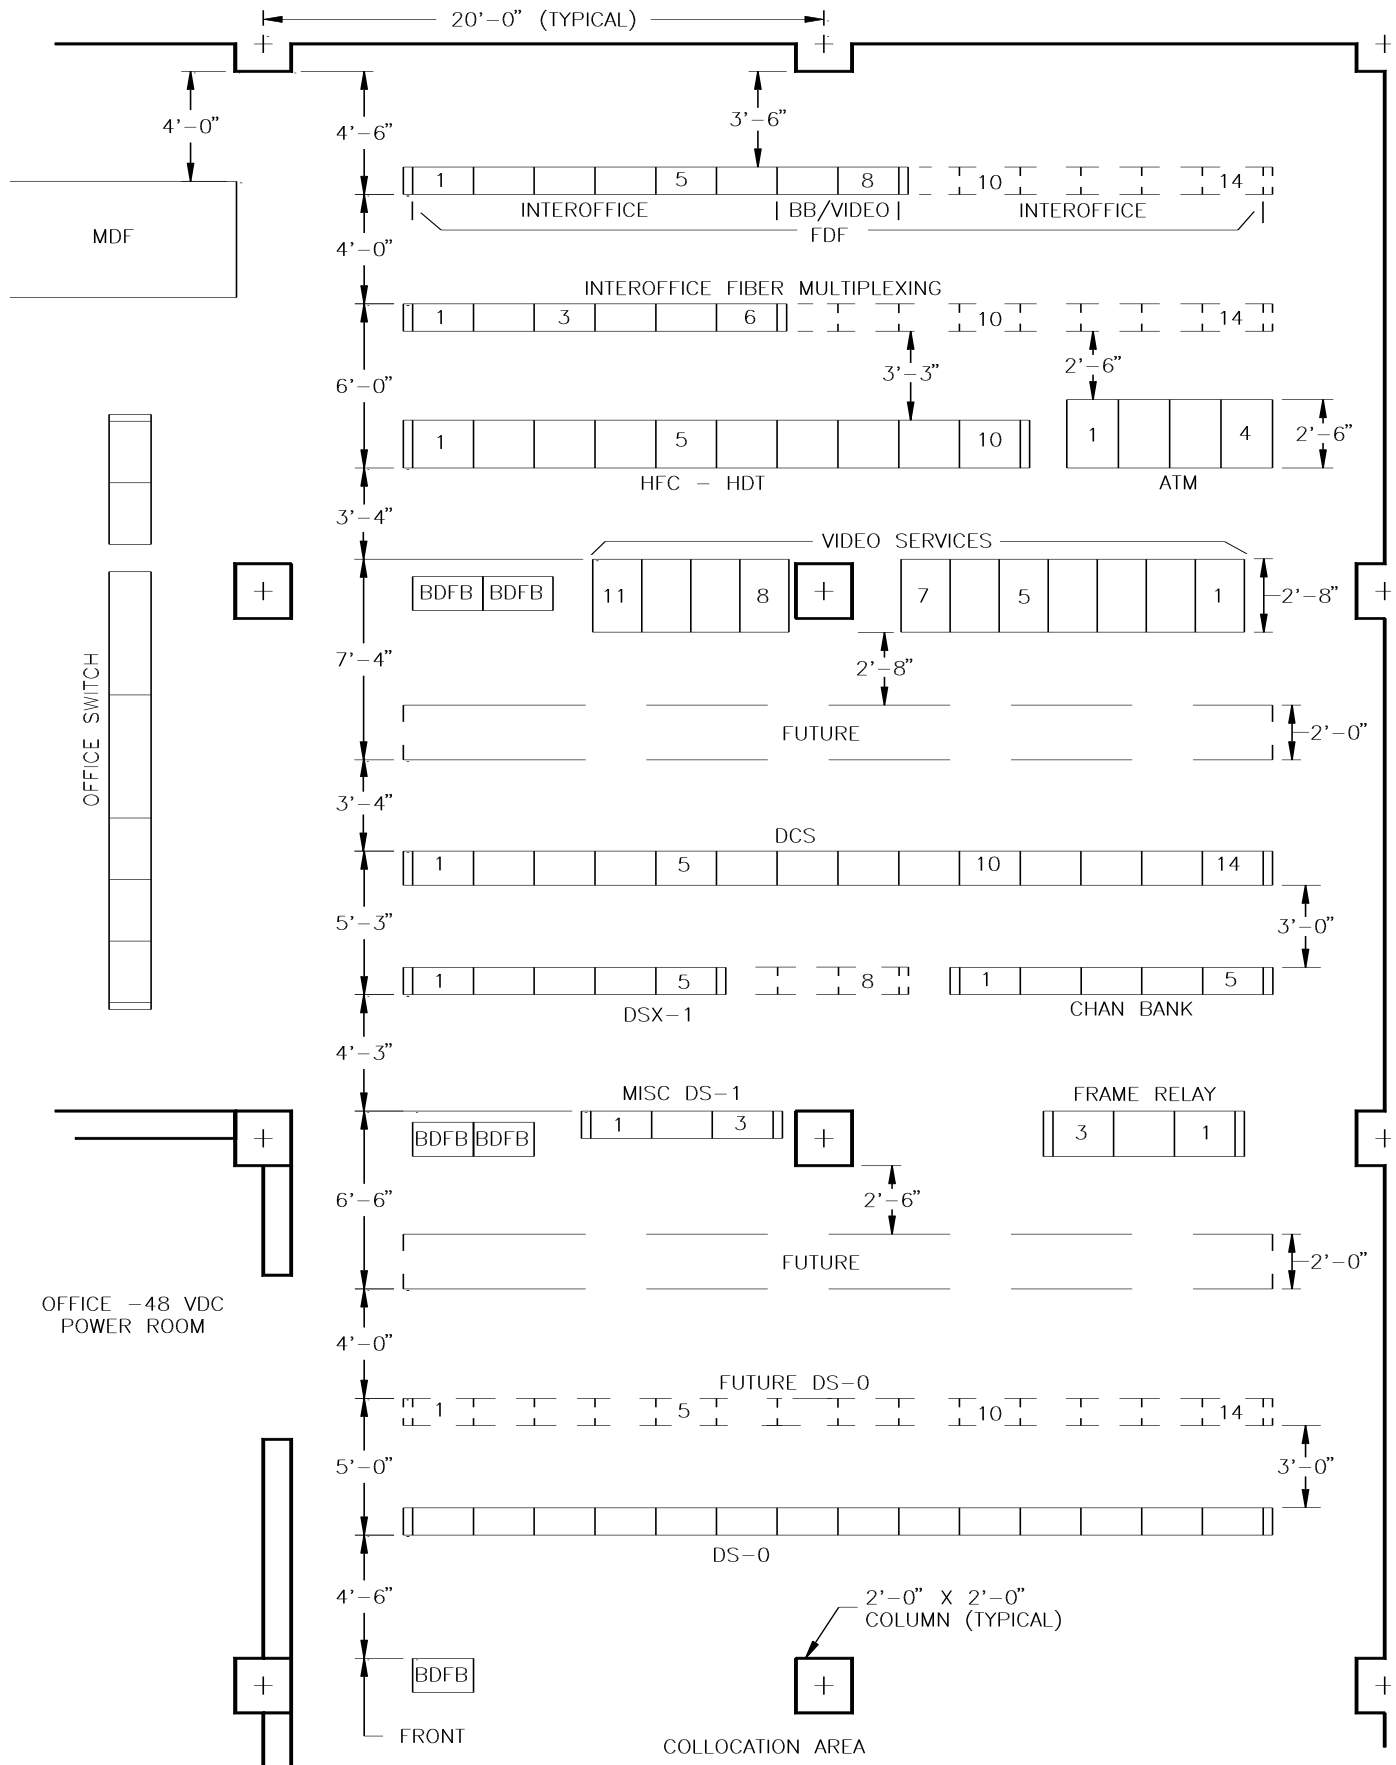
Typical Application Of Aisle Spacing Guidelines
